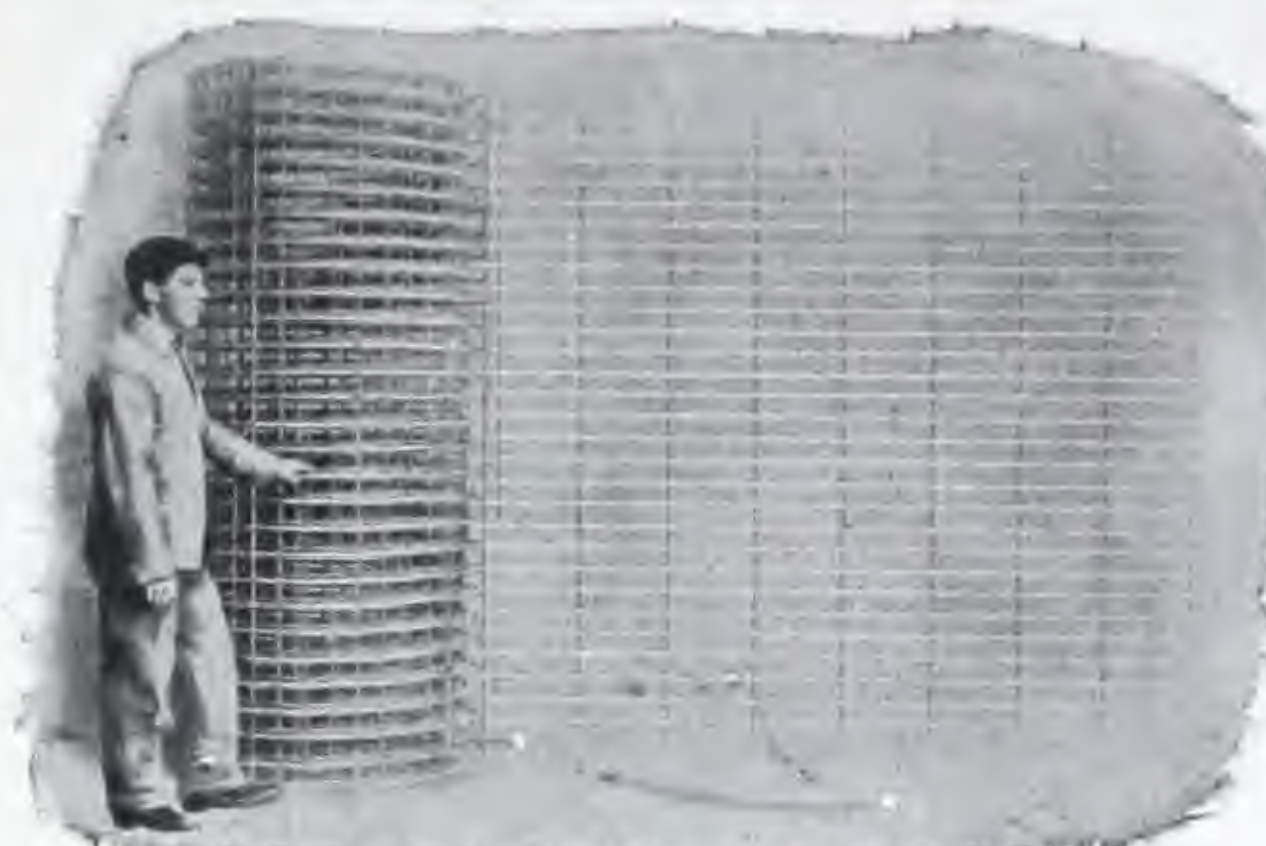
PHOTO OF ROLL OF CLINTON ELECTRICALLY WELDED WIRE FABRIC.
